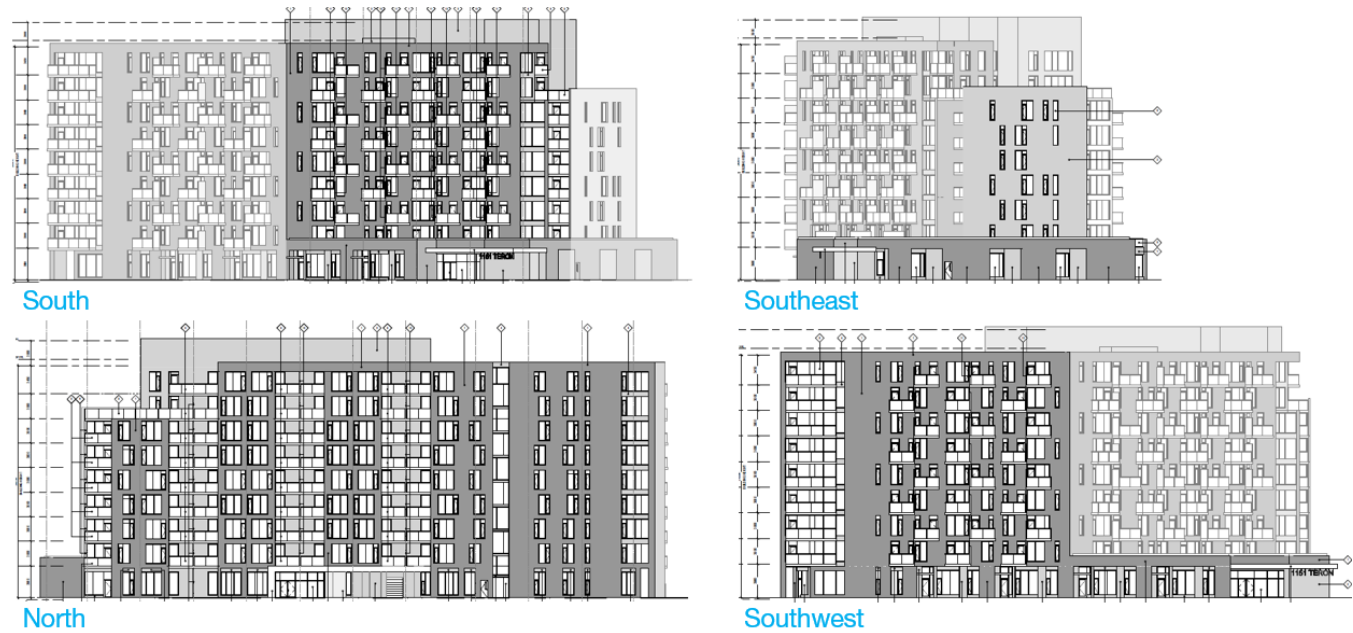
Elevation Drawings of the Proposed High-Rise Building at 1151 Teron Road
